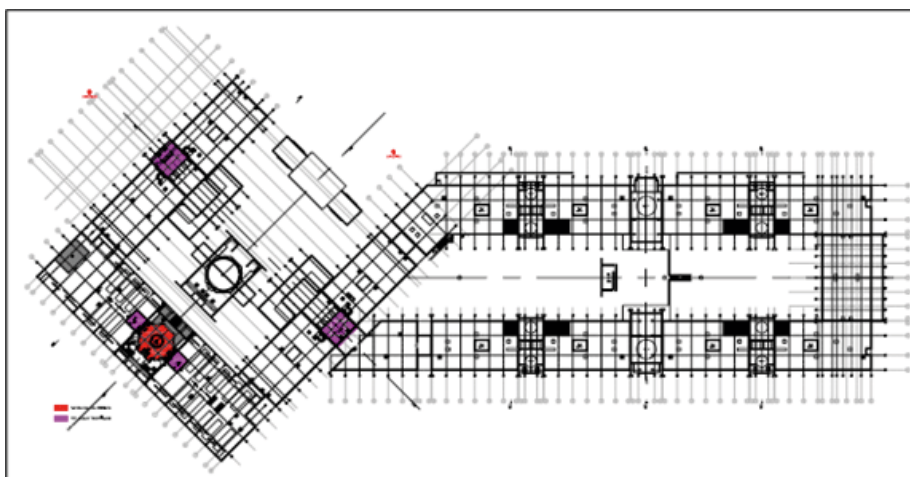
MAE Floor plan (source: A. Faïdi, architect).
